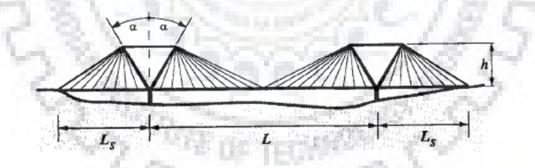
Spread pylon cable-stayed bridge (Starossek, 1996)
